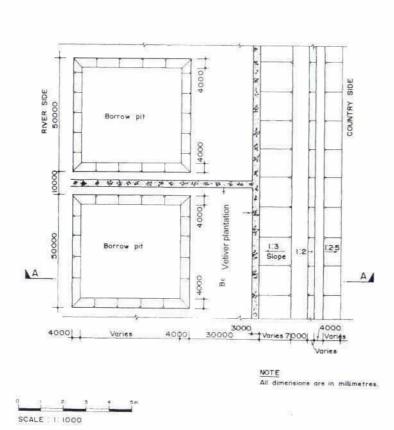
Recommended arrangement of borrow pits along embankments
